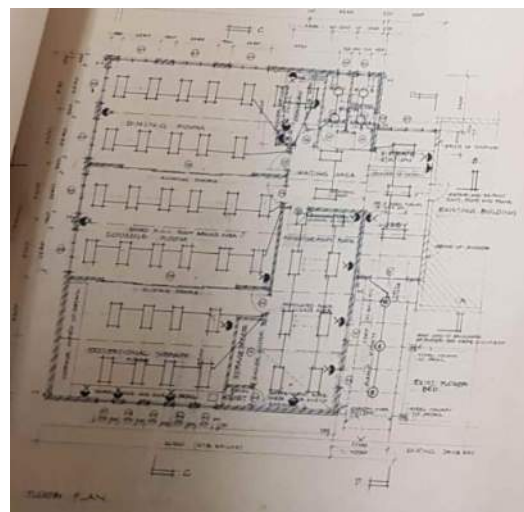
Existing architectural drawing showing rafter and masonry wall locations.
